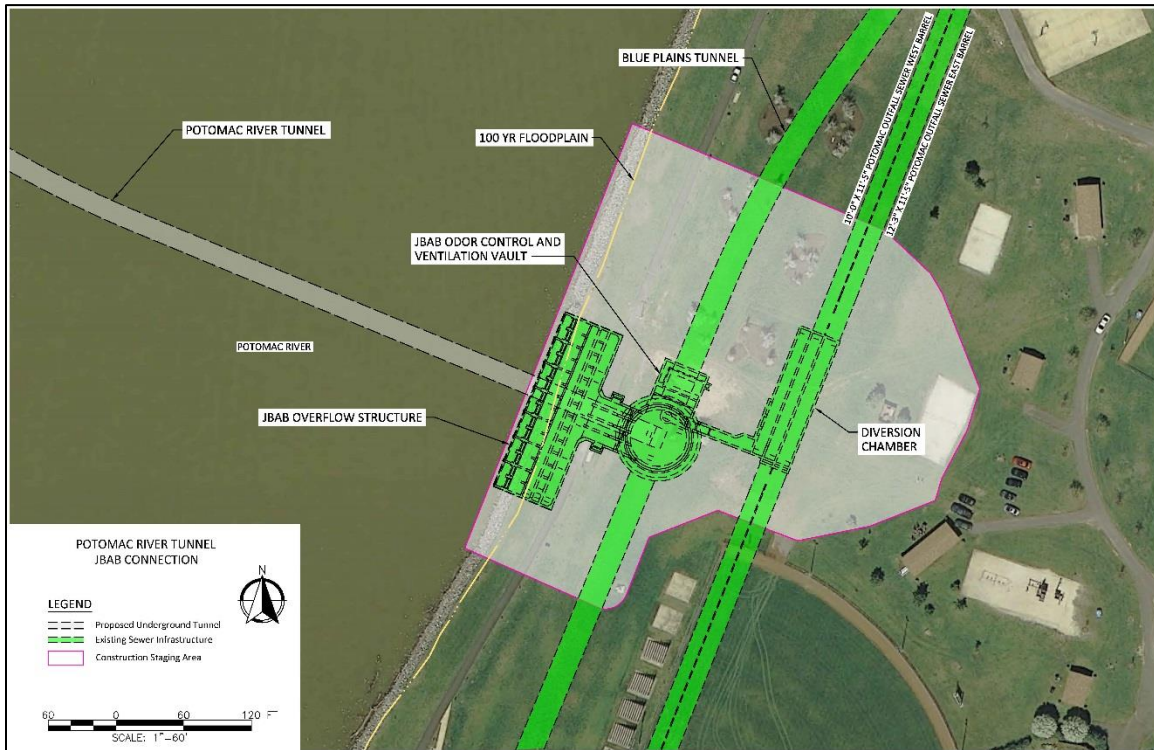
Tunnel Connection to Existing Shaft at JBAB
